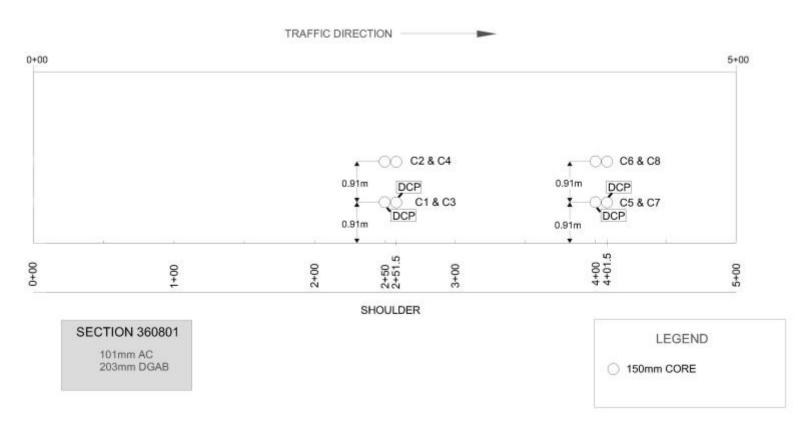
Layout of Sampling and Test Locations (October 7, 2008)
